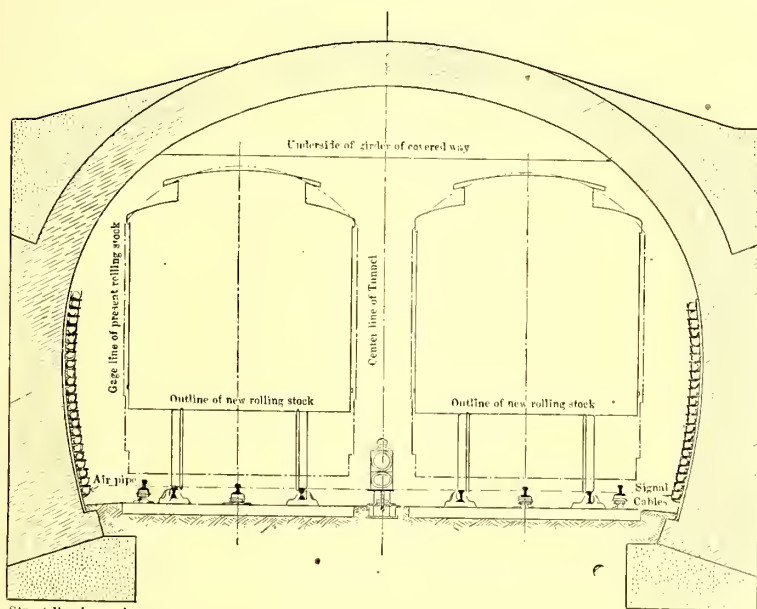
CROSS SECTION OF DISTRICT RAILWAY TUNNEL, SHOWING ARRANGEMENT OF CONDUCTOR RAILS AND HIGH-TENSION CABLES ON TUNNEL WALLS
